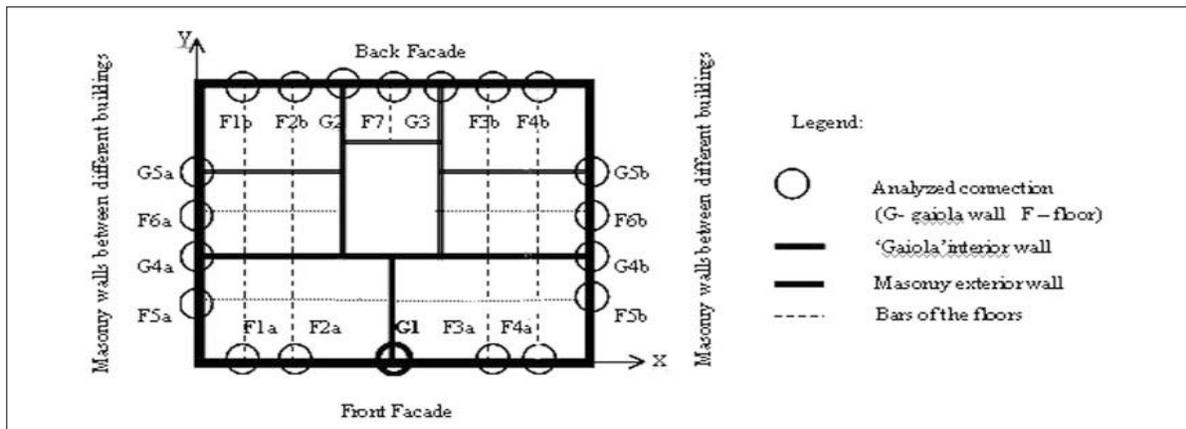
Plan of the numerical model of the building identifying the different walls, the bars simulating the floors and the connections between the timber elements and the masonry walls
